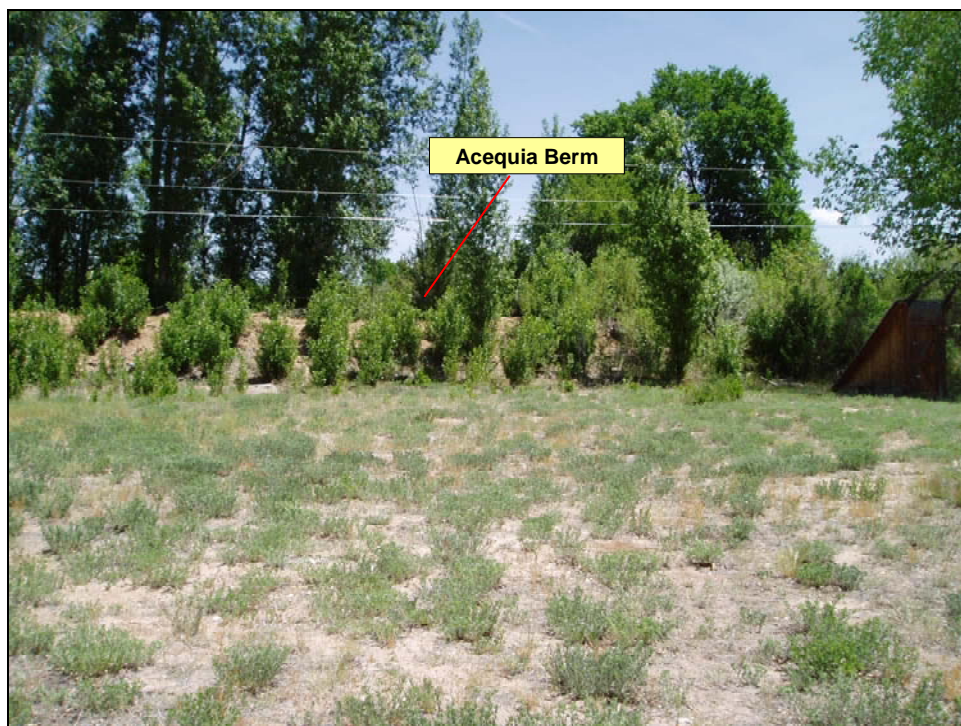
Typical cross-section of the western portion of the acequia, showing field gate, facing northwest.
